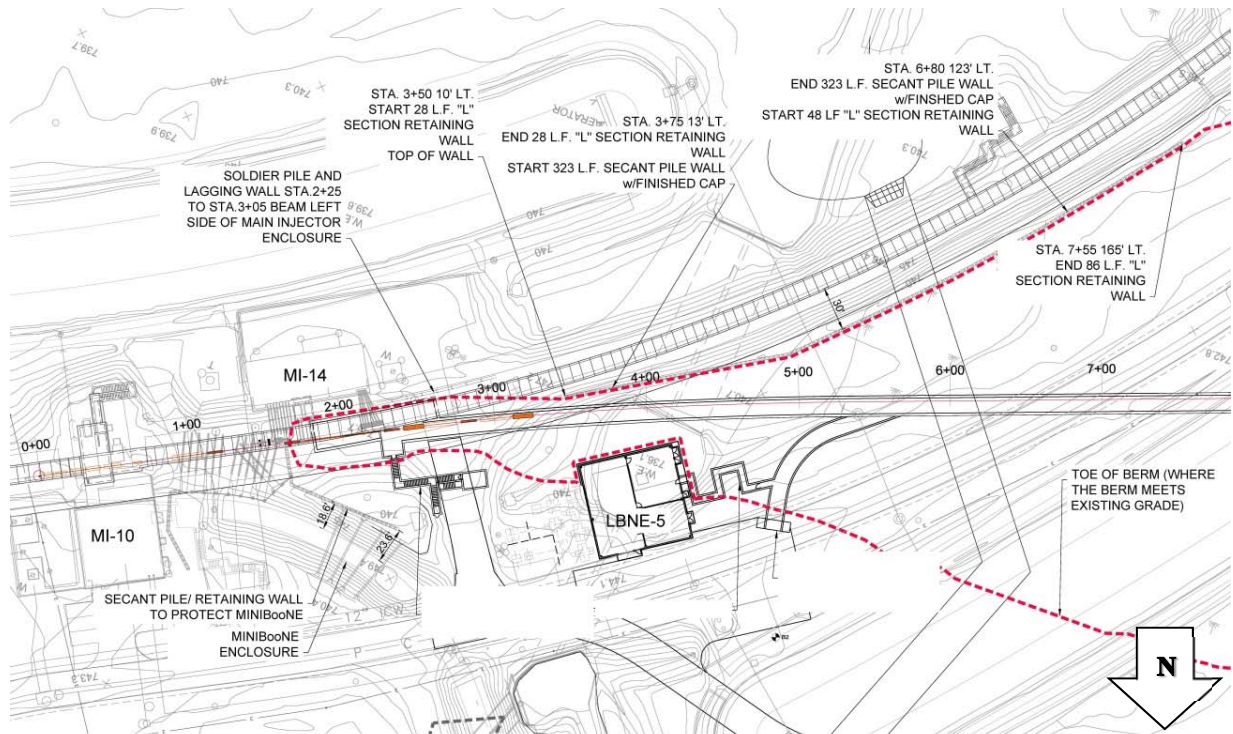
Braced Excavation and Retaining Wall Systems.
